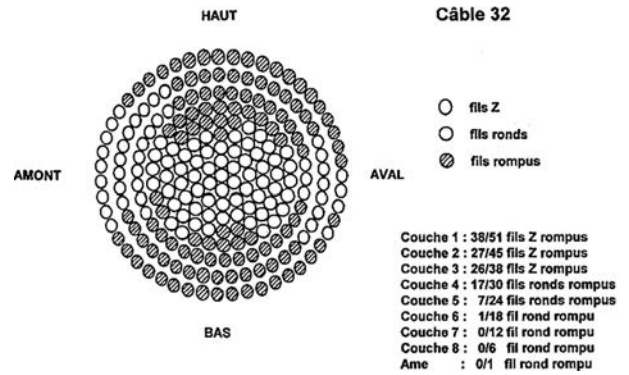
Distribution of broken wires at the Saint-Nazaire Bridge; stay cable 32 downstream.
